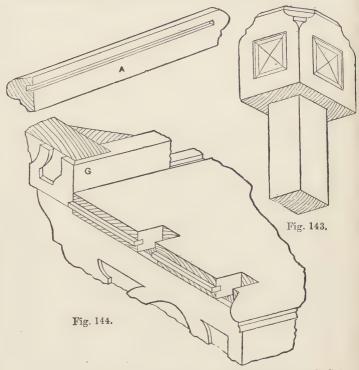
Lower Part of Newel. Fig. 144.—Details of Sunk Cut String and Returned Nosing.
